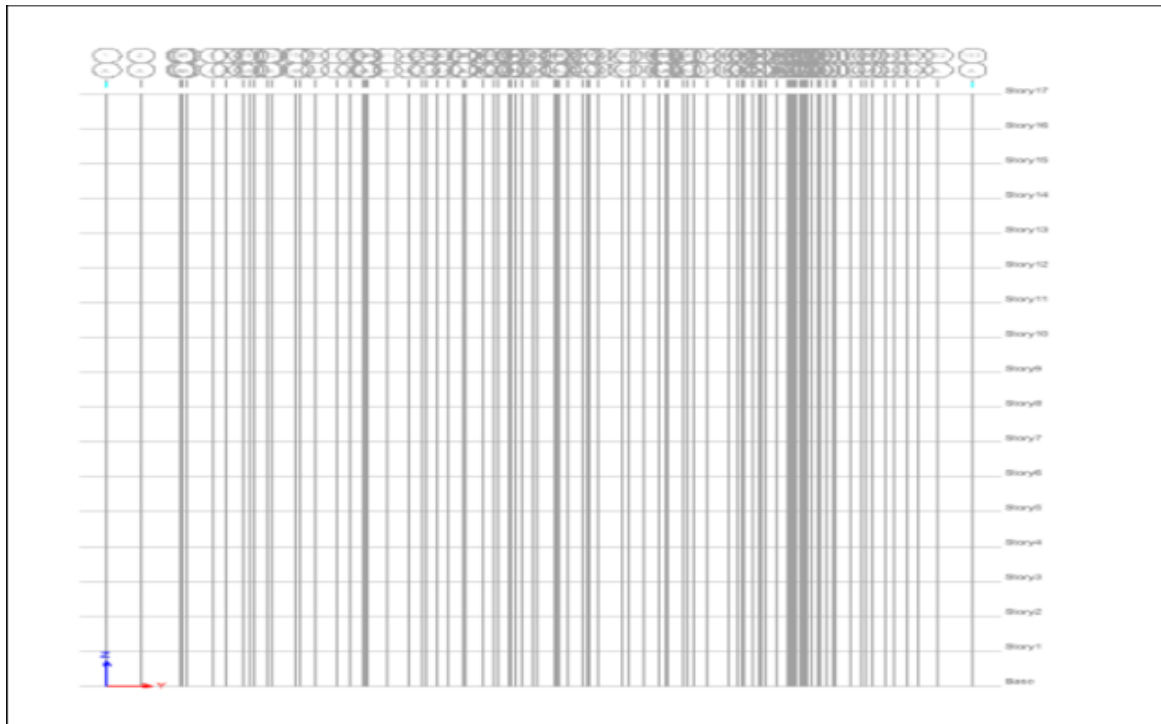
Elevation of (G+15) multi-storied building in ETABS
